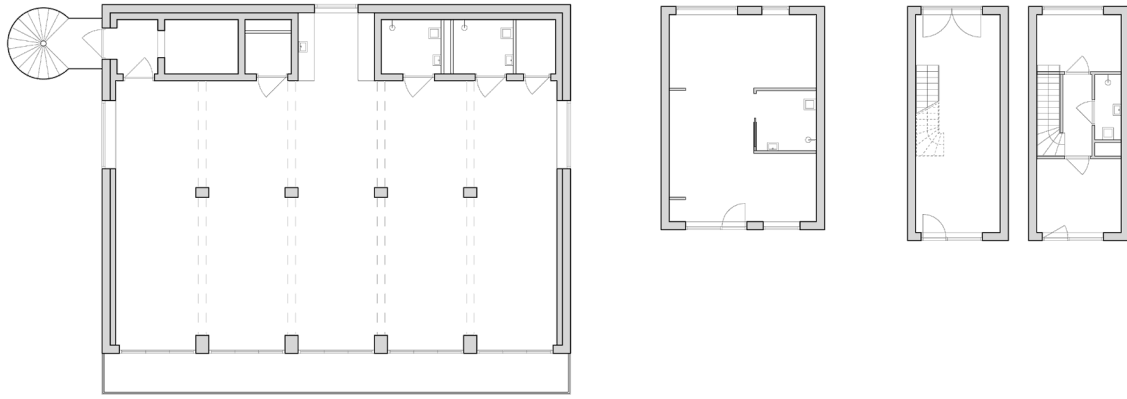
Floorplan of a shared apartment, studio and loft (ground floor and first floor)
